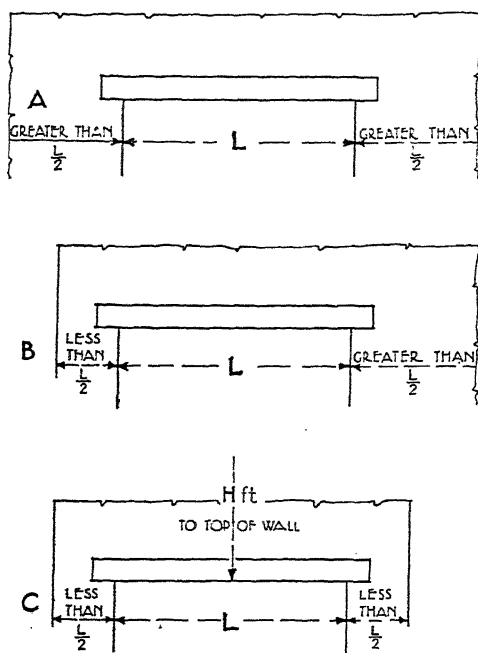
HOW TO CALCULATE LOADS FOR LINTELS IN BRICK WALLS
